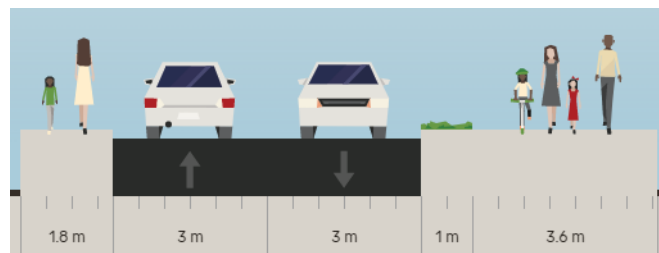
Slí Ógie Uí Dhufaigh street cross section
